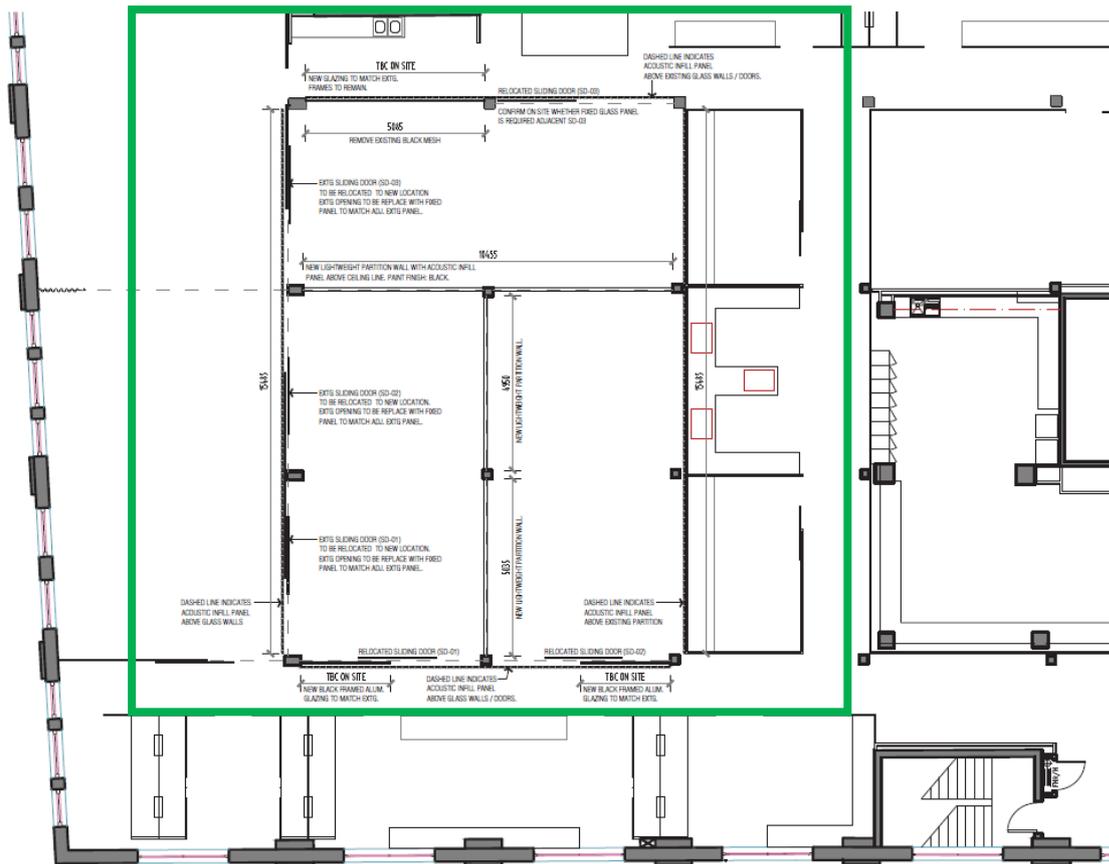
The proposed internal alterations to Level 2 (location of proposed works outlined in green)
